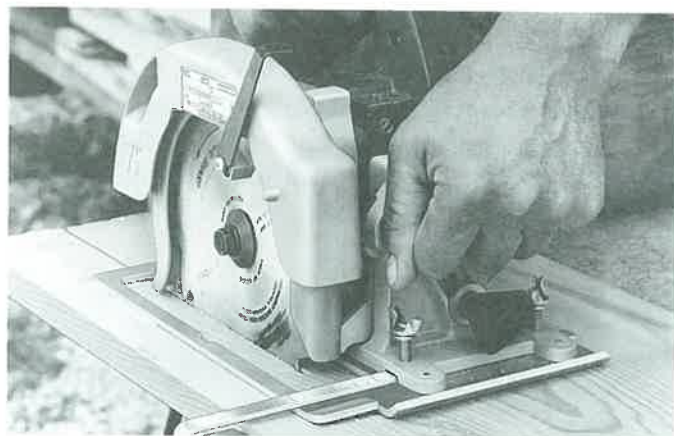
Align the saw notch with the line marked on the material. (*Milwaukee Electric Tool Corp.*)
